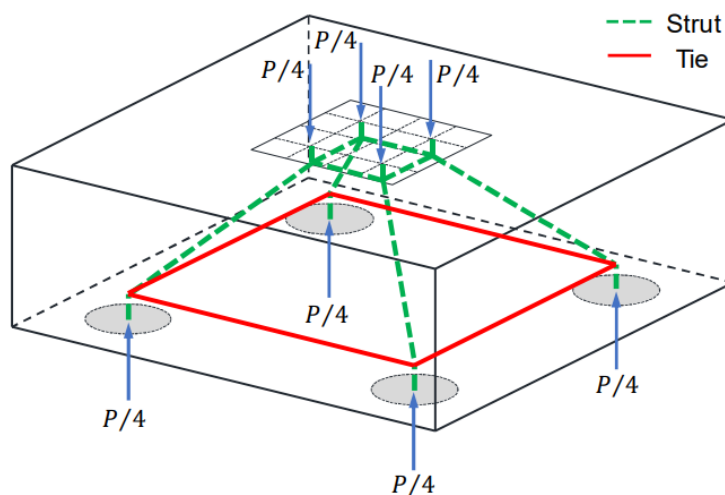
Generalized 3D strut-and-tie model for drilled shaft footings under pure axial load (from Project 0-6953)
